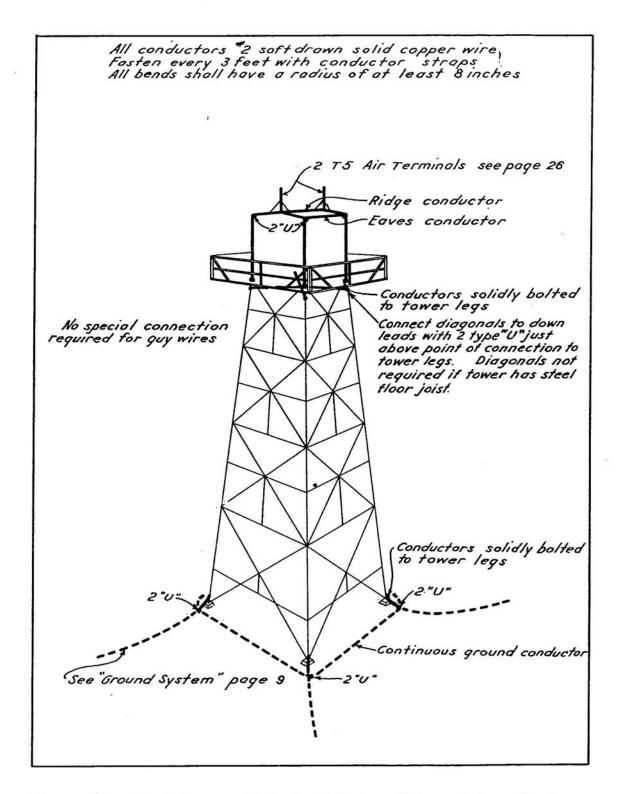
Steel tower with 7- by 7-foot or flat-roofed wood cab.
